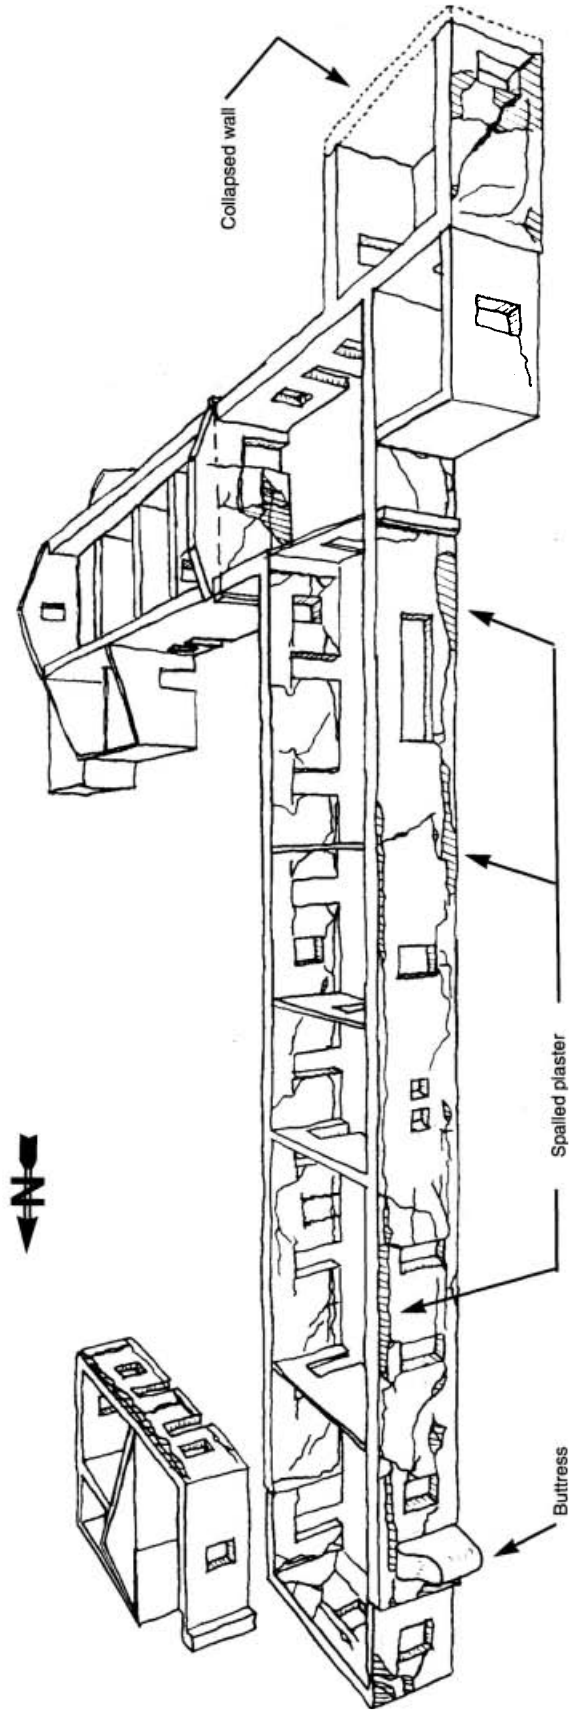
Drawing of Del Valle Adobe at Rancho Camulos, viewed from the west.
